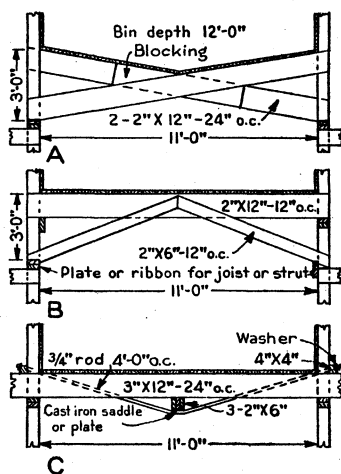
Supports for grain bin of 12 feet maximum depth, over 11-foot driveway: A, Crossed joists forming semihopper bin floor; B, joist with knee braces; C, trussed-beam support
